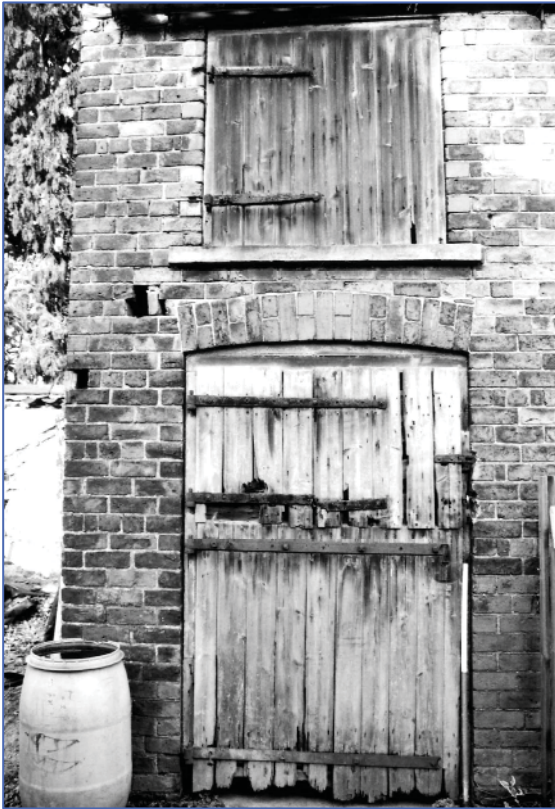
Doors in the lower and upper stories of the east elevation, looking west-north-west
